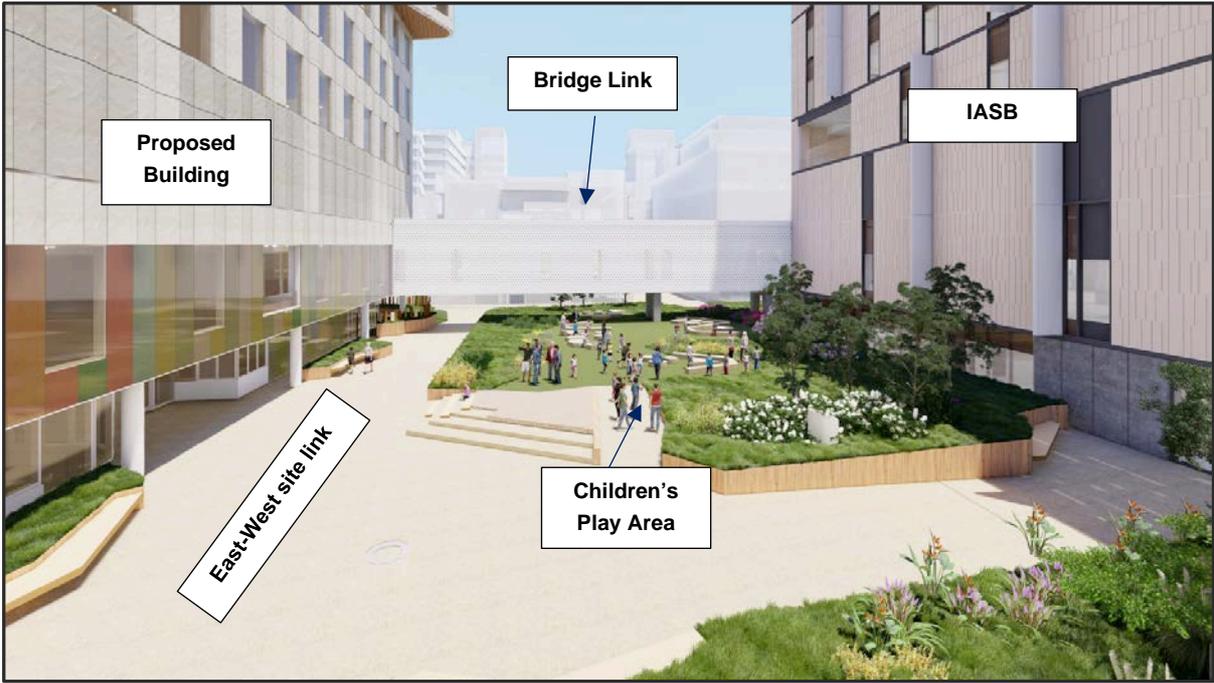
| Proposed children's play area, through-site link and bridge link to IASB building to the south of the site (Base source: RtS)
